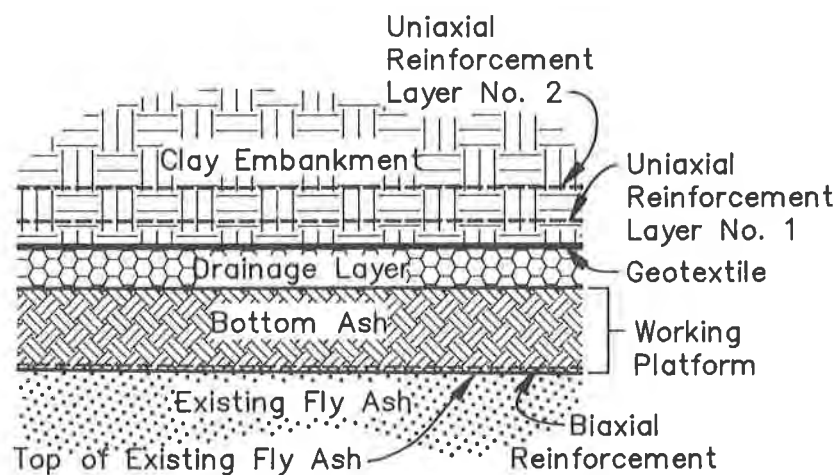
Typical Section of Working Platform and Embankment Reinforcement
